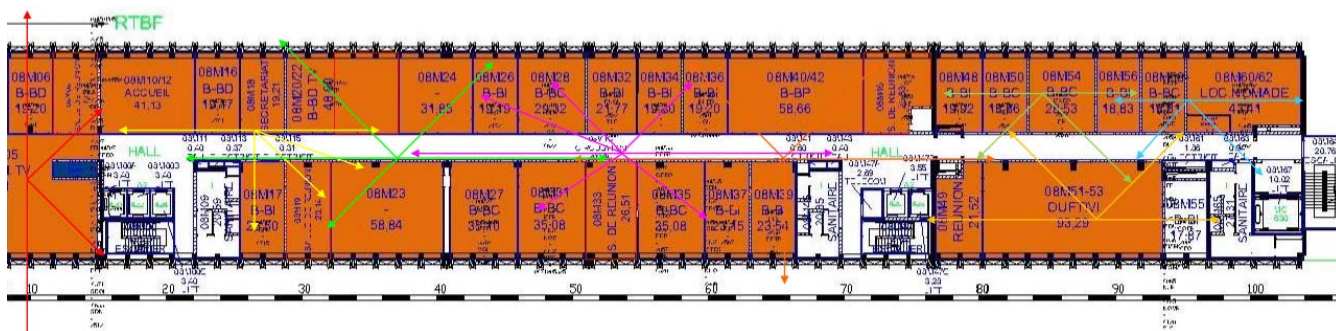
Design at 5 GHz for Floor 8 in Building CHJM
